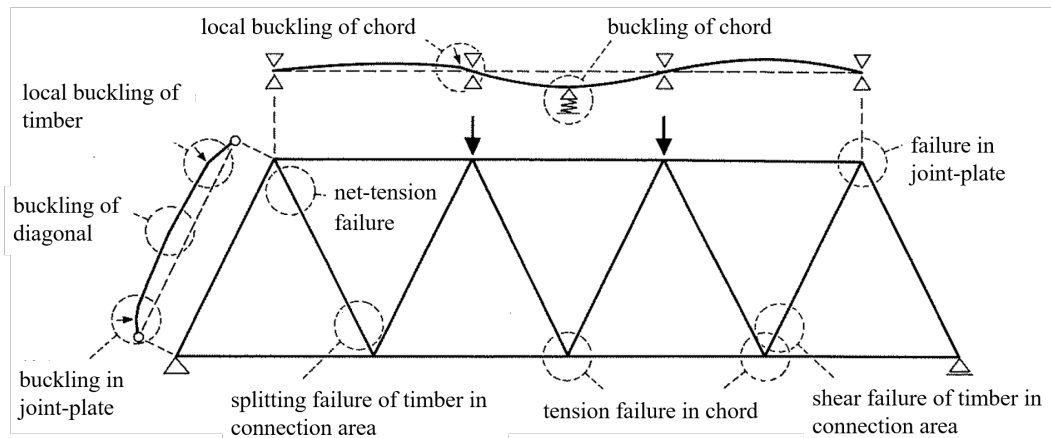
Observed failure modes in tests on timber trusses with dowelled steel-to-timber connections conducted by [49] (translated).
